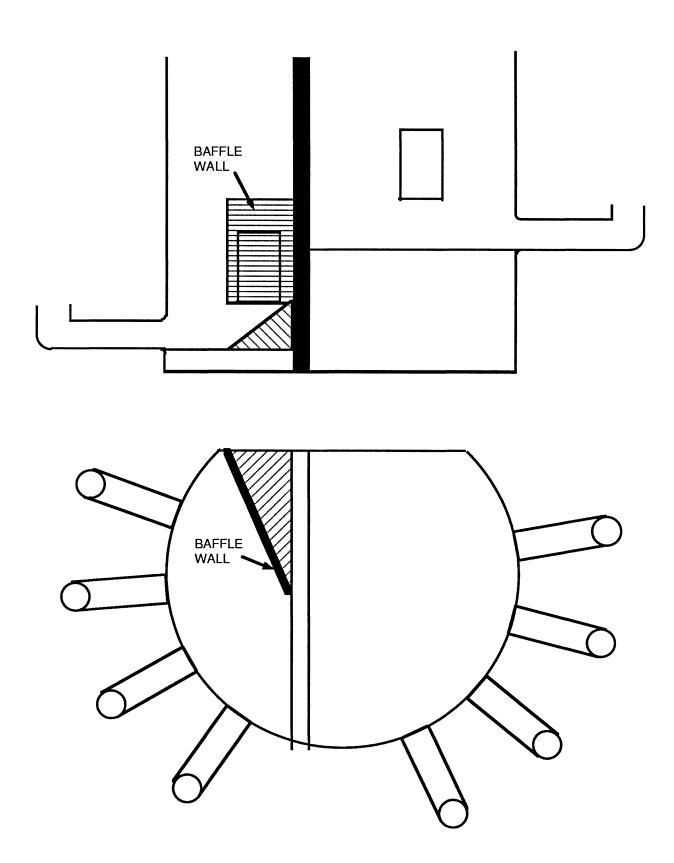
Addition of 20 ft by 30 ft Baffle Wall to Wet Well 1.
